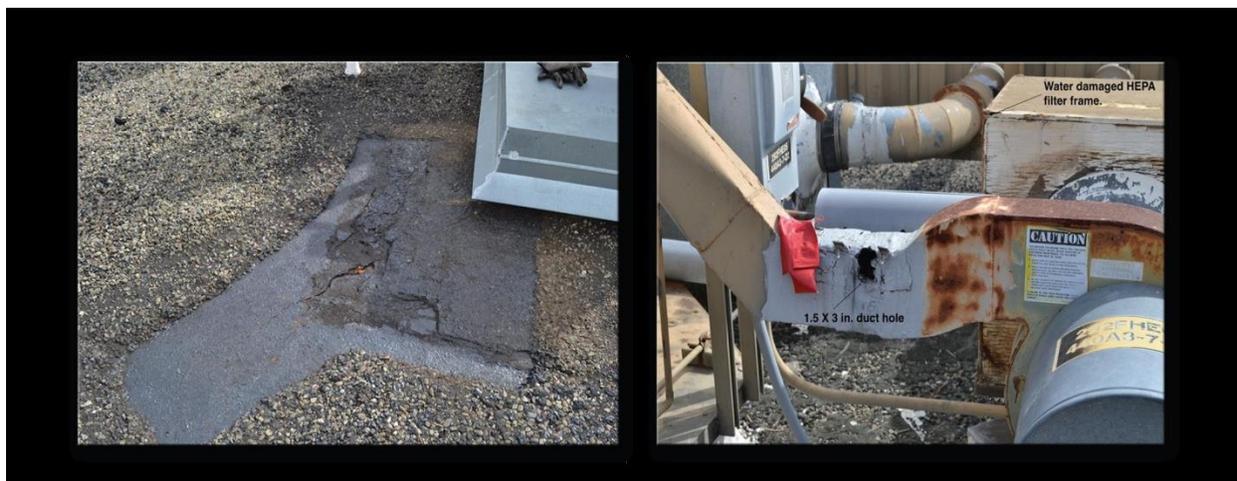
Roof failure at LLNL B292 (Source: LLNL 2013)
